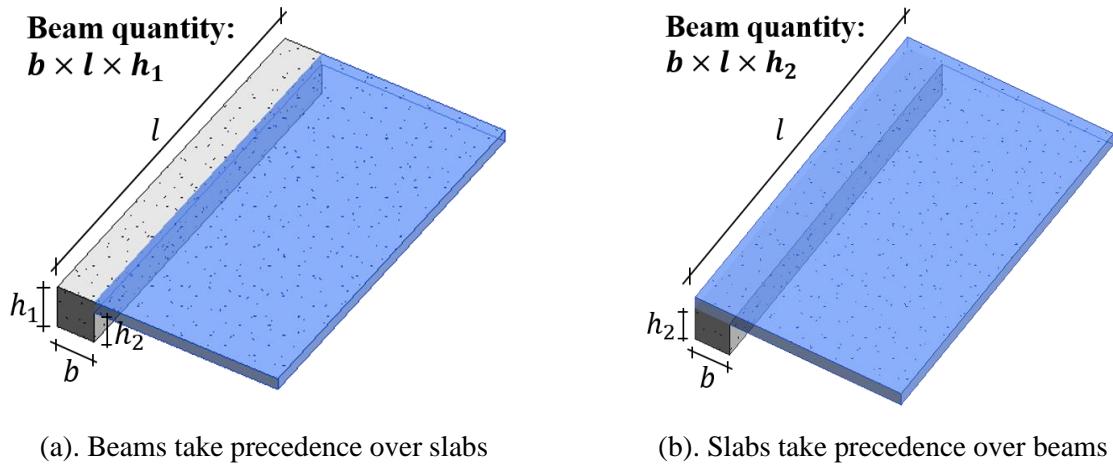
Inconsistent modelling styles for a beam-suspended slab joint [5]
